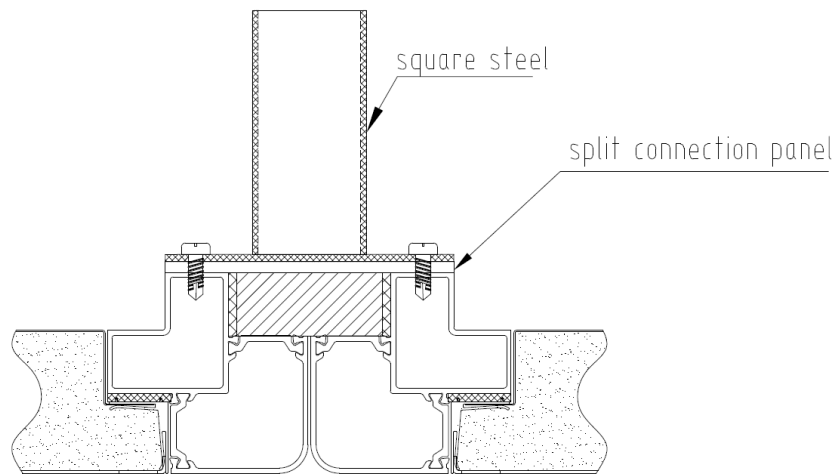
Square Steel Installation at Bottom Tier Casing
